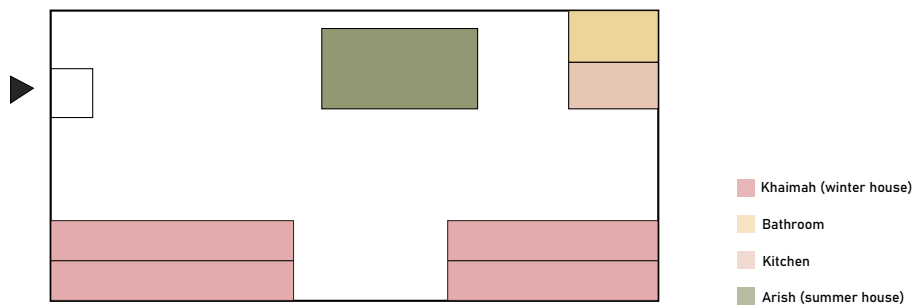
, redrawn plan of Arish house within the courtyard as sketched by a household (Piesik, 2012, p. 130)
